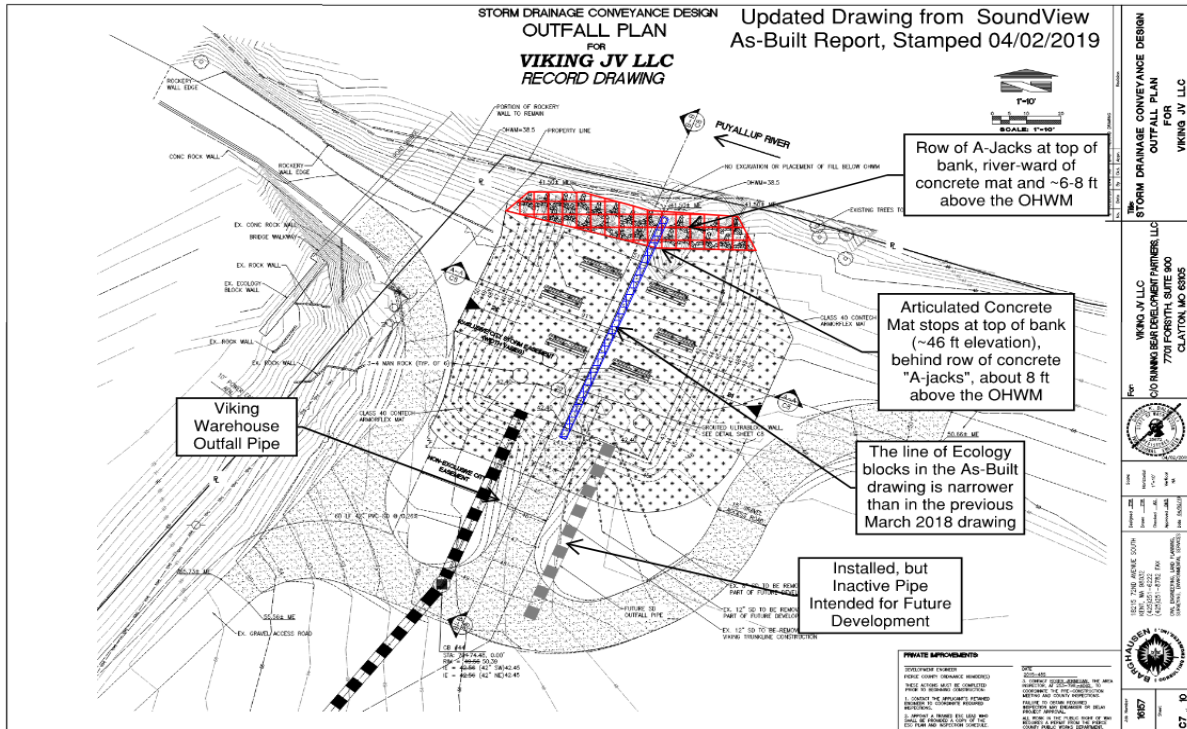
Adapted Plan View of As-Built Changes from the Originally Approved Outfall Structure Design
